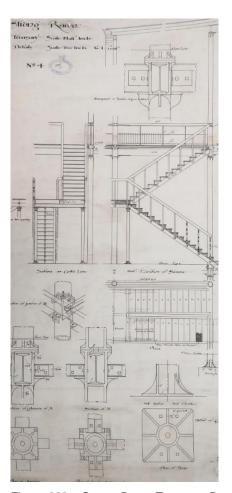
Strong Room Treasury: Detail of internal double narrow-u stair (now removed)
